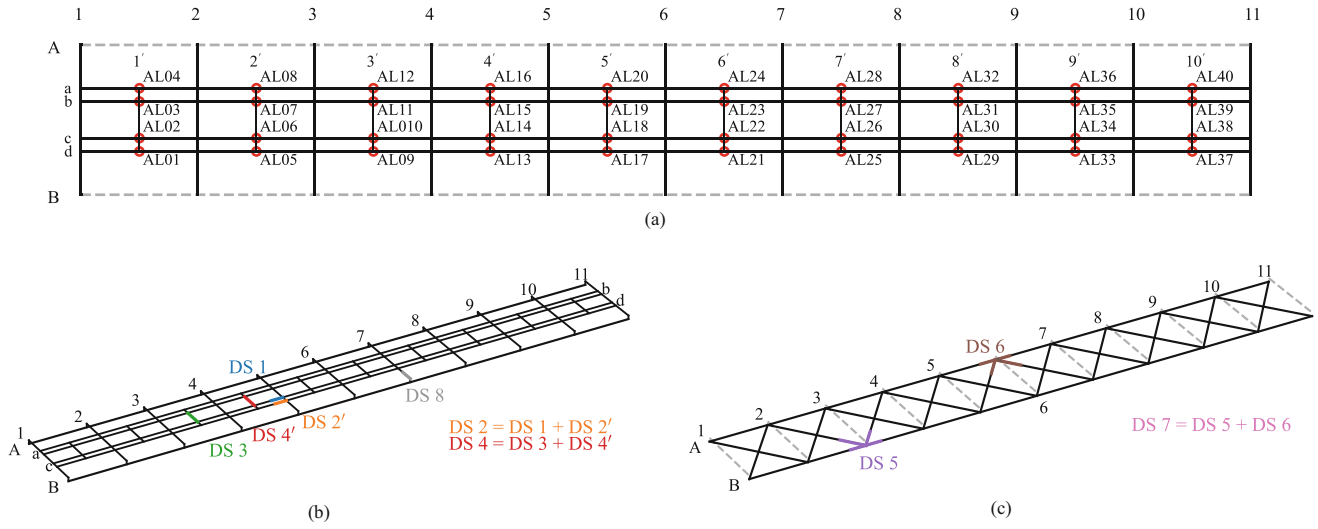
Overview of the experimental conditions. (a) Location and numbering of accelerometers on the bridge deck. (b) Damage locations on bridge deck. (c) Damage locations on the lateral bracing
